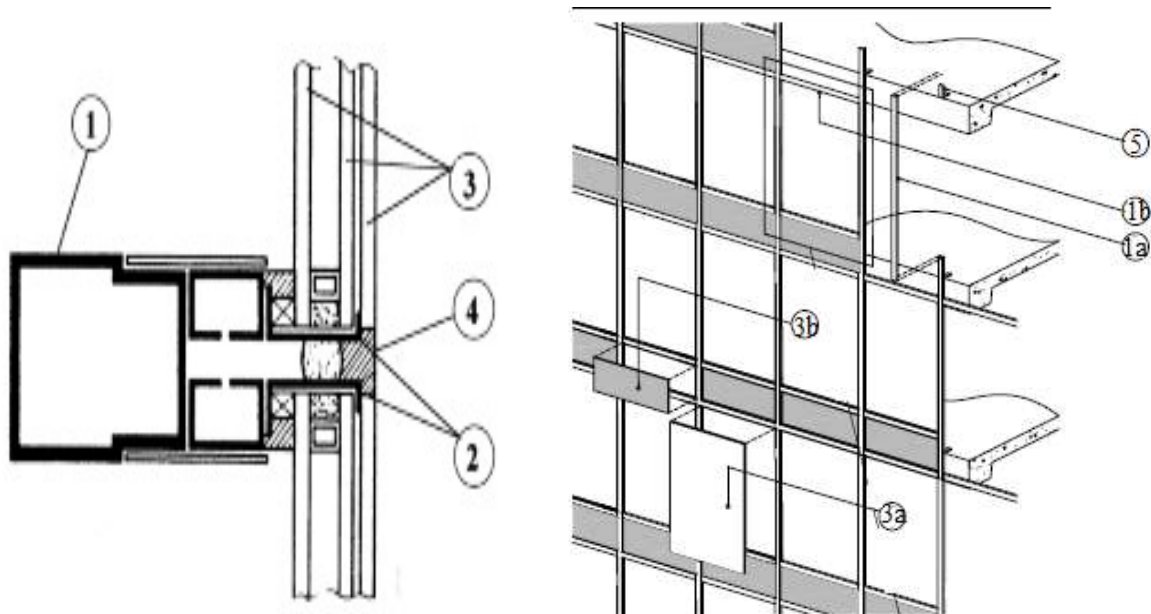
Metal framed glass façade system: (1) Load Bearing Structure, (1a) Mullion, (1b) Rail, (2) profile system, (3) Glazing, (3a) Vision panel, (3b) Spandrel panel, (4) Fastening system and (5) Anchor (Kallioniemi, 1999)
